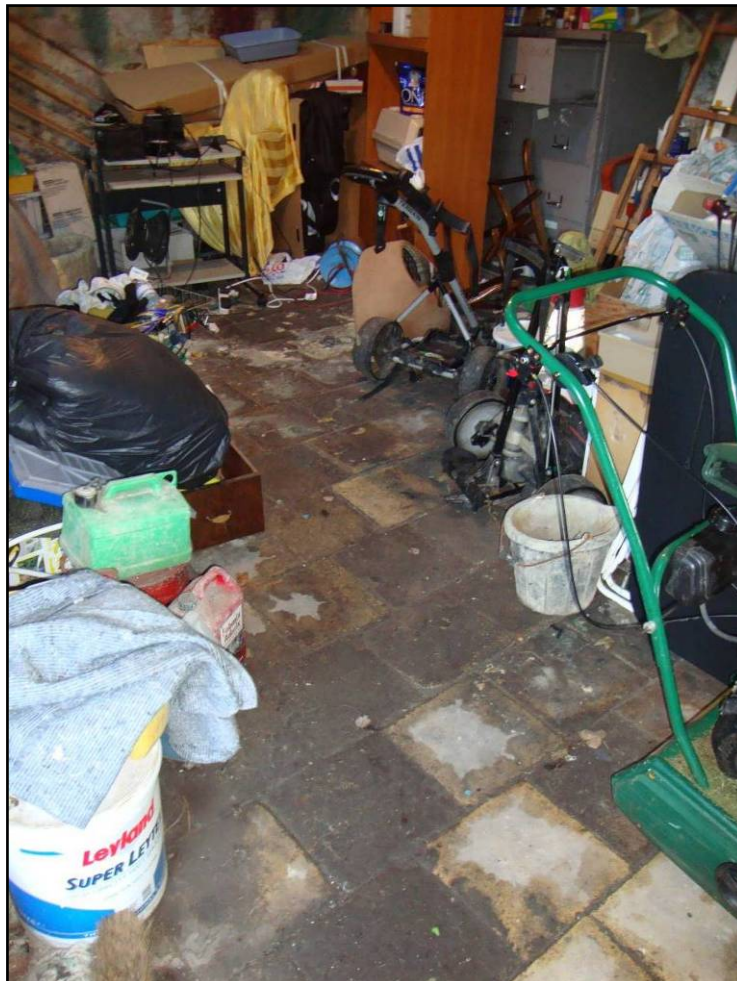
Internal view of the former farm building showing quarry tiled floor and current use as a store.
